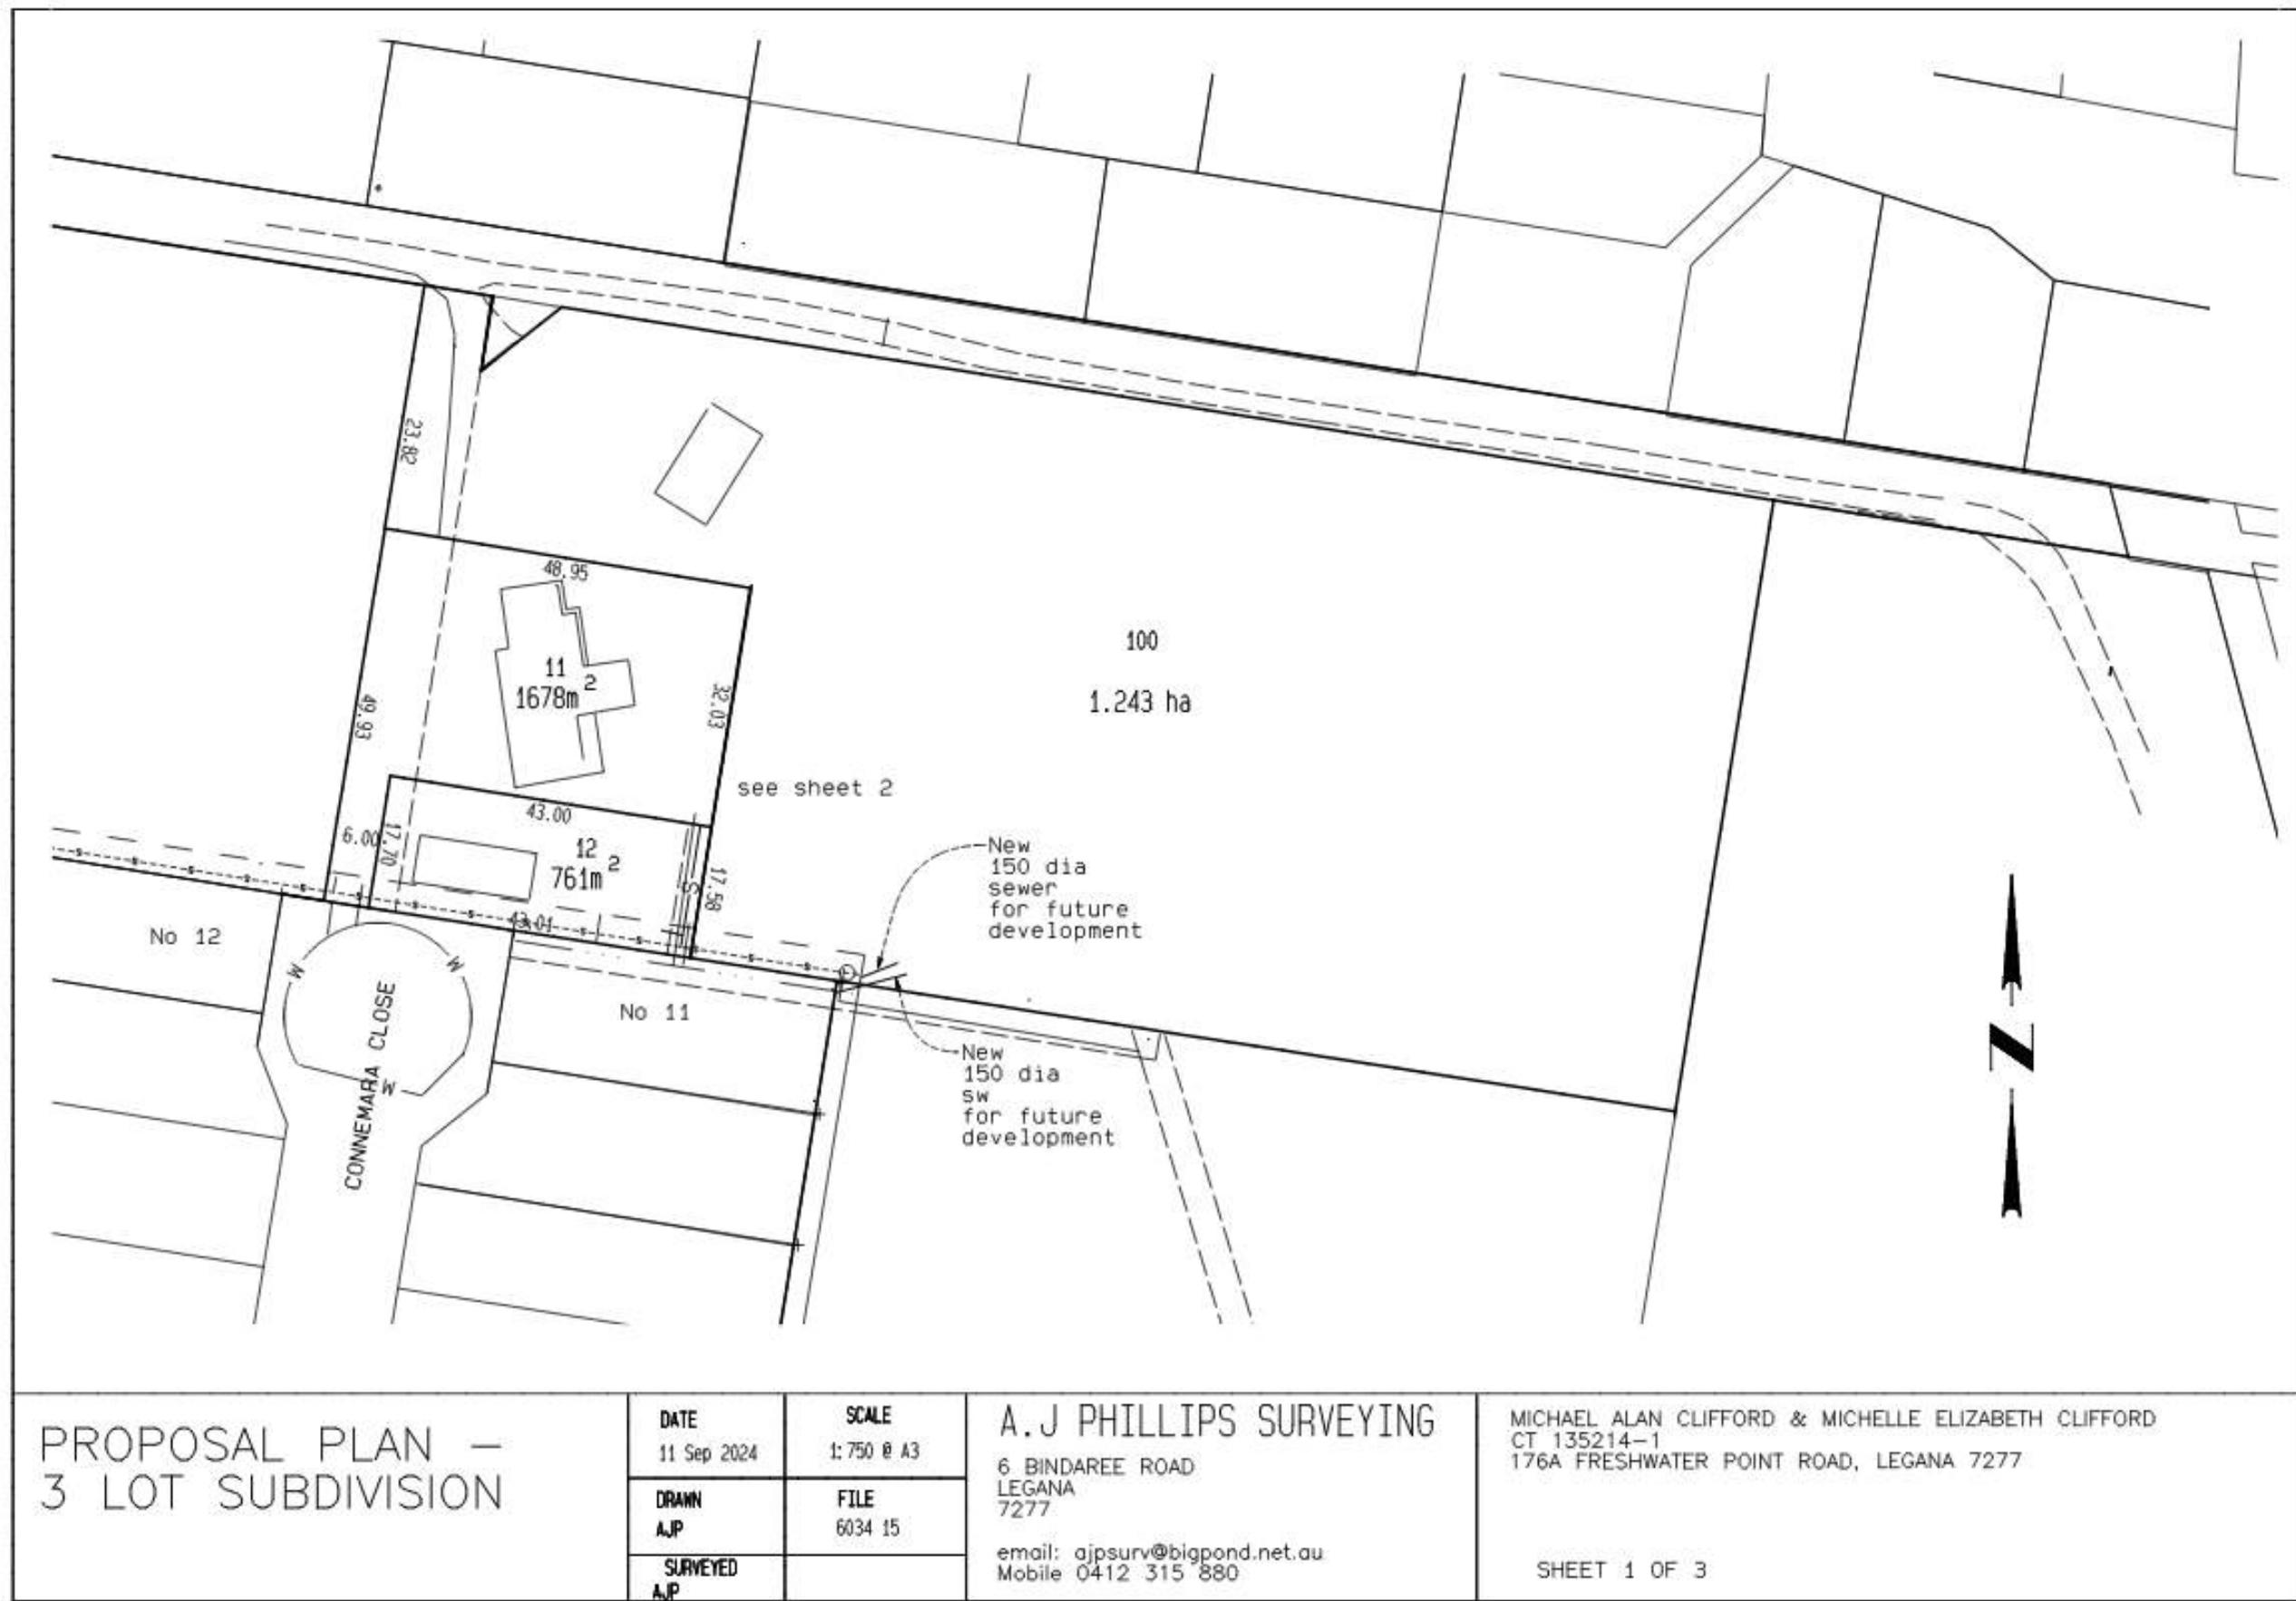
Site plan for approved subdivision (PA2023277), Lot 100 is the subject site for the proposed 10-lot subdivision
